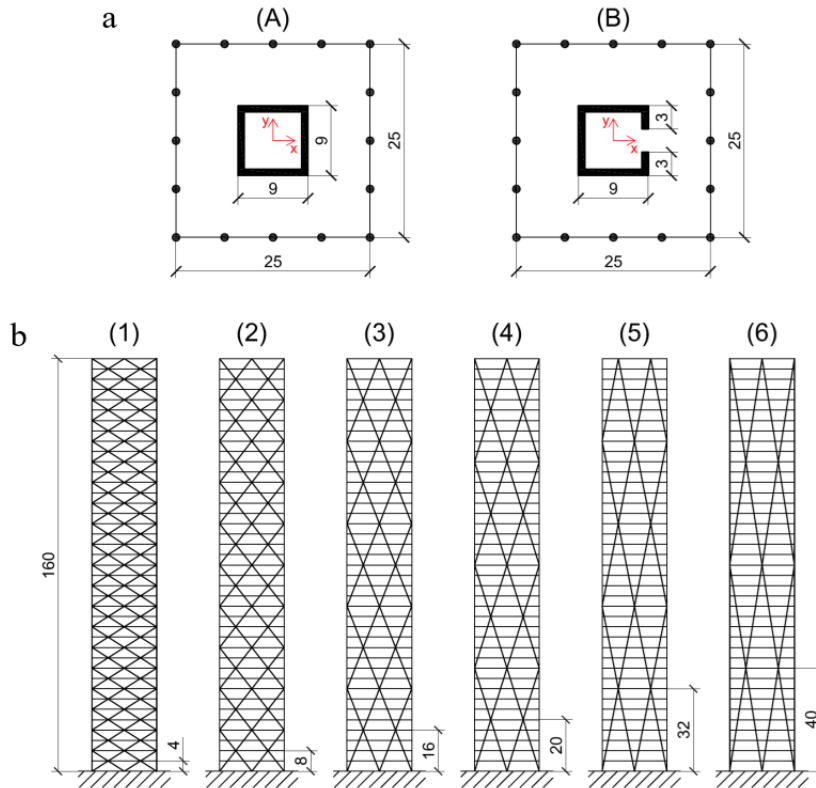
Building geometry: (a) floor plans, (b) lateral views.
